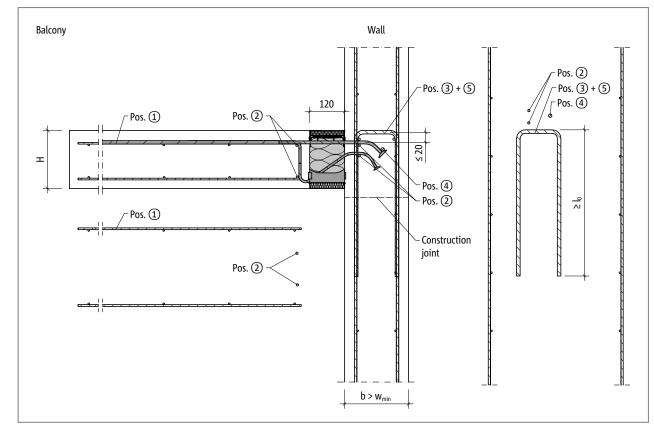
Schöck Isokorb® XT type K-O: On-site reinforcement for wall connection with larger structural element dimension ((wvorh > wmin)
